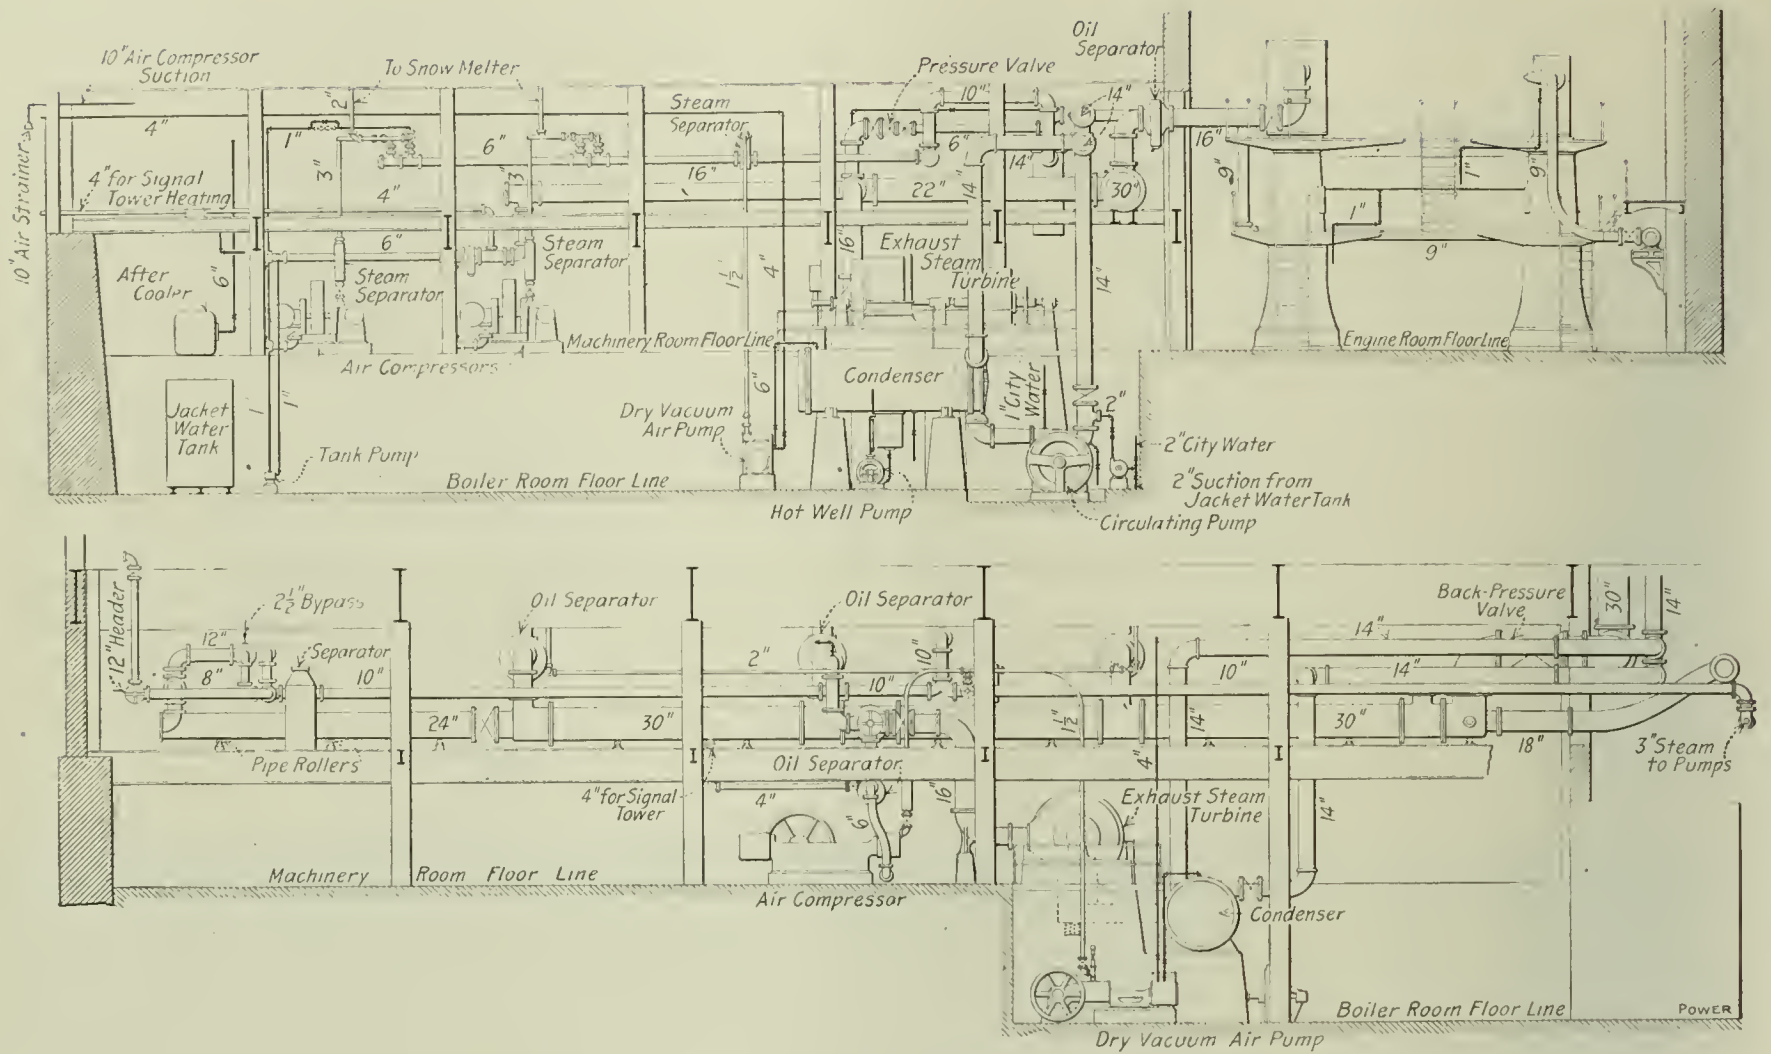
SECTIONAL ELEVATIONS THROUGH ENGINE AND MACHINERY ROOMS
